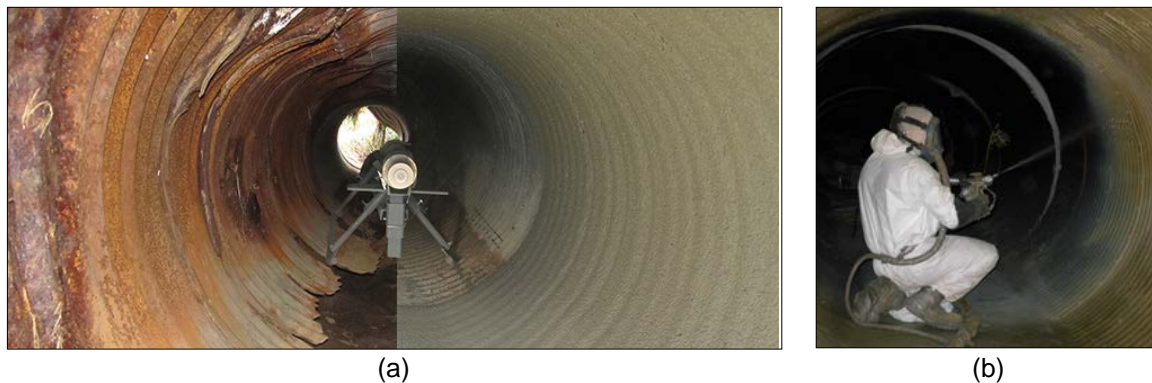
Corrugated metal pipe culverts (CMPs) before and after SAPL rehabilitation: (a) cementitious SAPL installation using spin casting machine (Source: CentriPipe) and (b) polymeric SAPL installation with hand spray (Source: Sprayroq).
